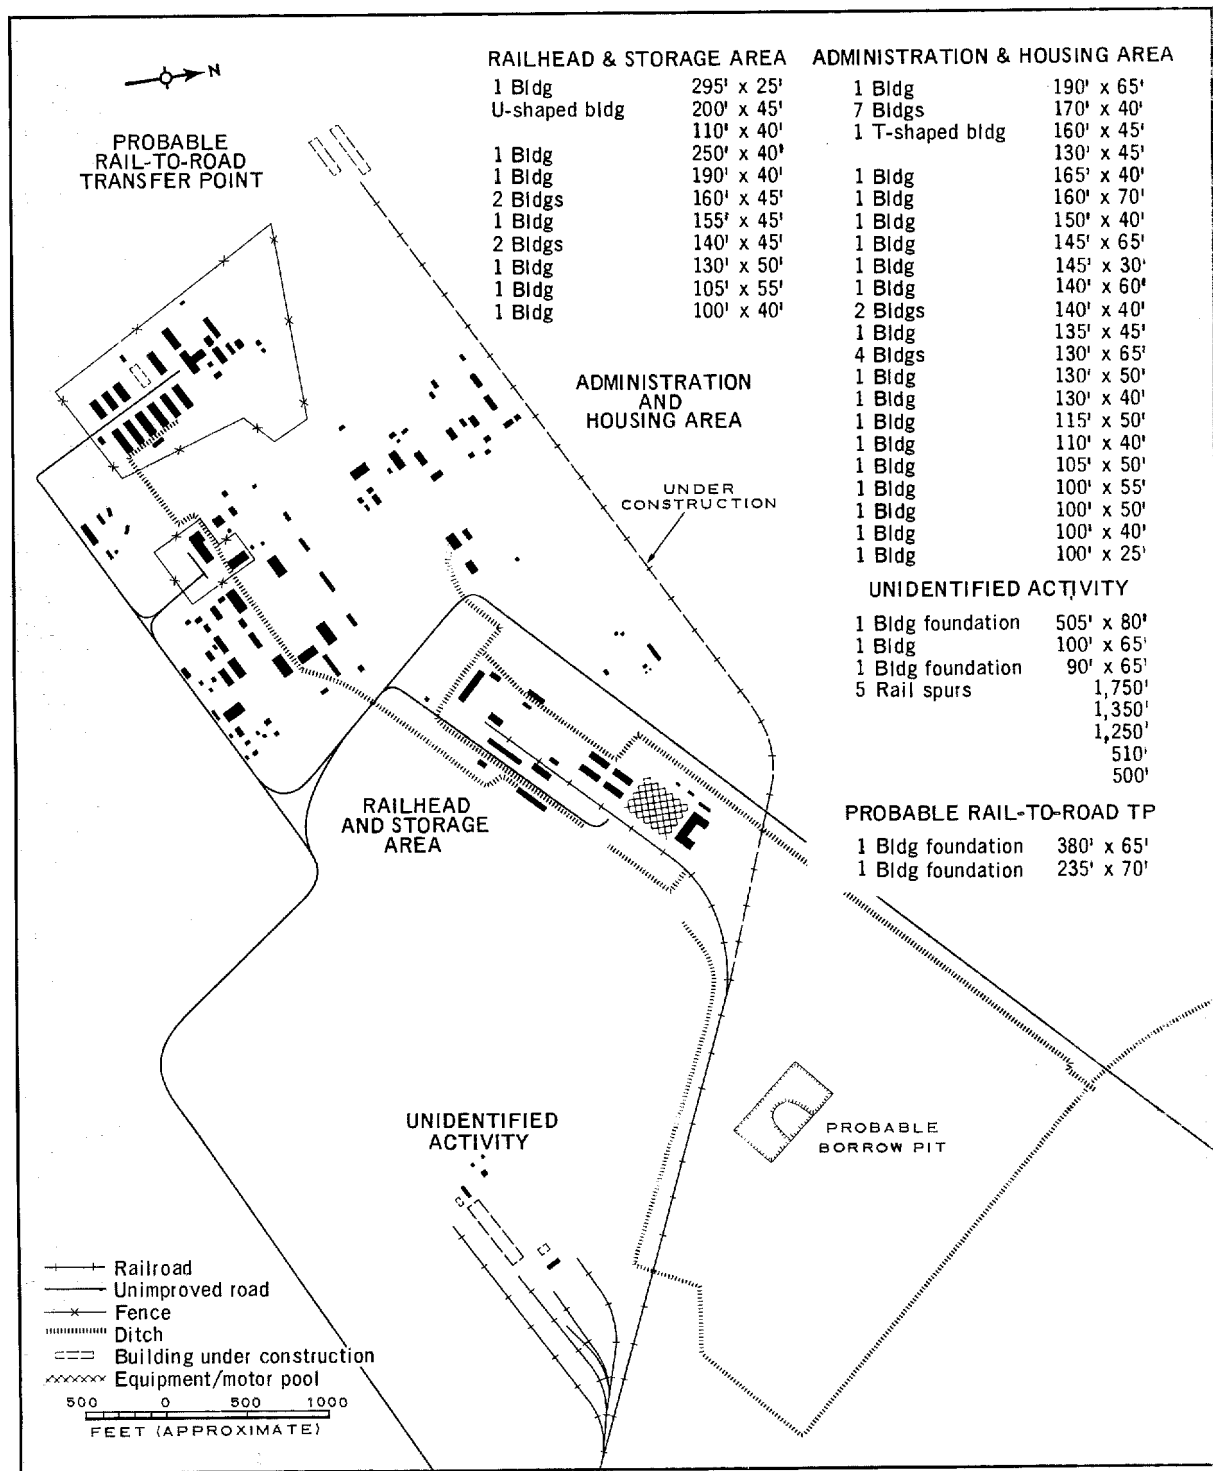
LAYOUT OF COMPLEX SUPPORT FACILITY.
